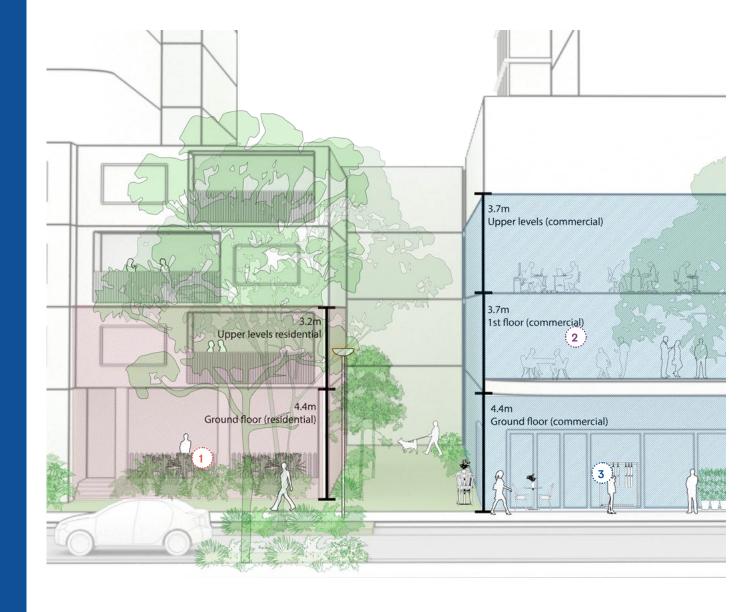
Key design guidance for floor to floor heights to ensure amenity, flexibility and a consistent street wall.
